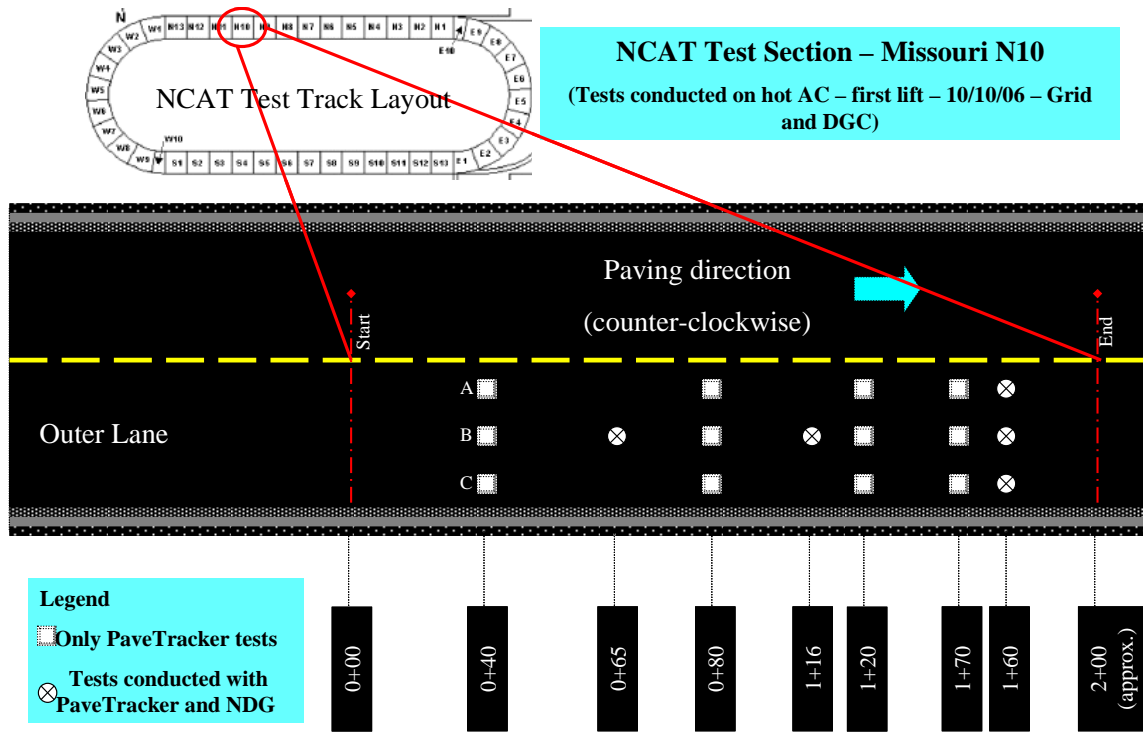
Test Point Layout Along Missouri N-10 Test Section at NCAT (refer to Tables B.14 and B.15)
